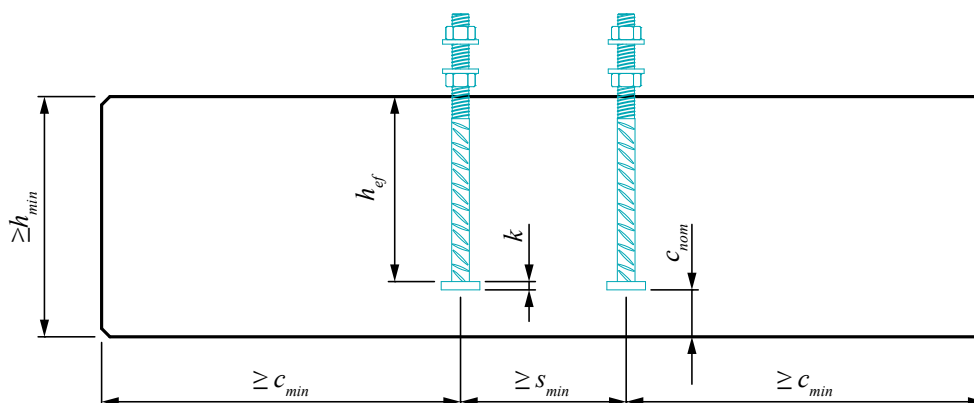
Installed HPM® L Rebar Anchor Bolt.
